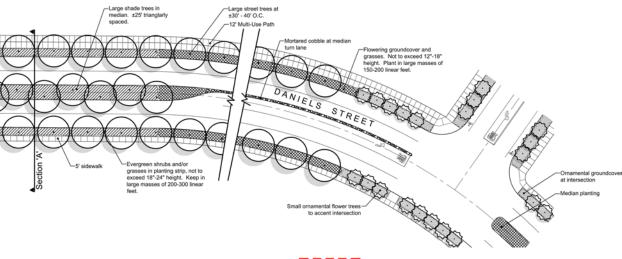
'A' Street - Daniels Street - Plan
